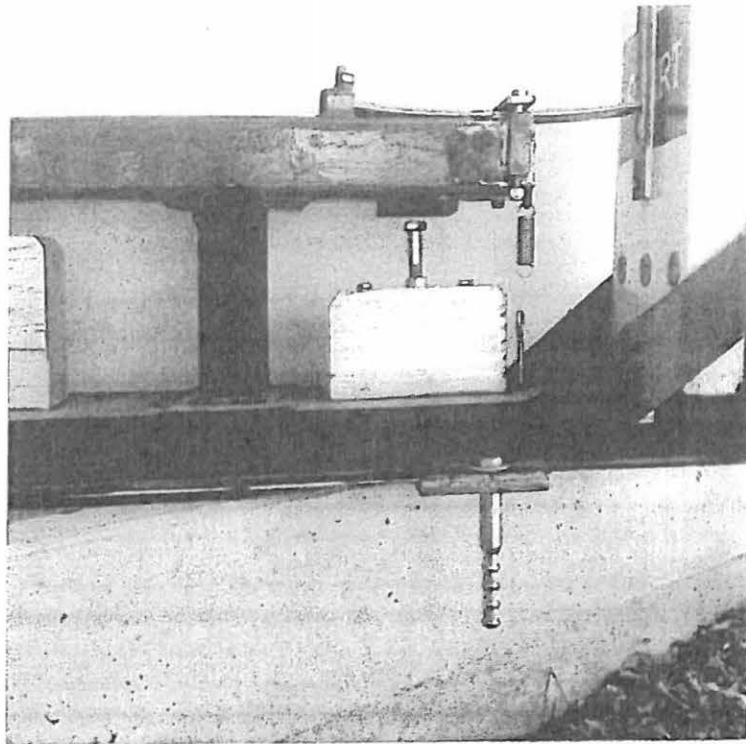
Photograph of the Hi-Striker base illustrating one of the Stainless Steel anchors bolted to the steel base plate. These anchor will be embedded in the concrete pad.
